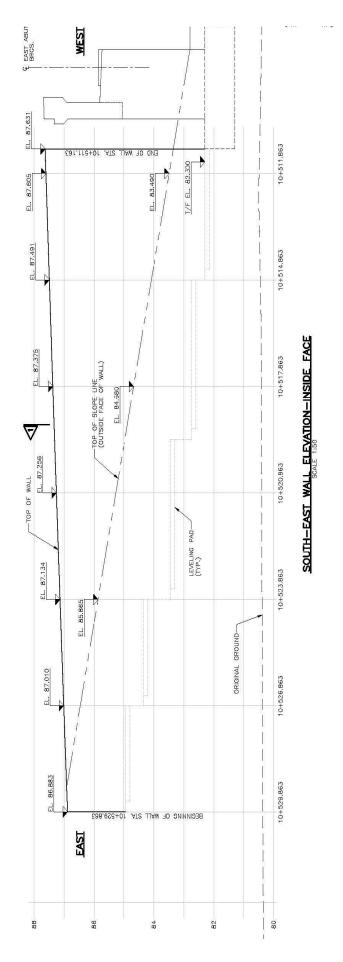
Sample Drawing Showing Top of RSS Elevations and Slope.
